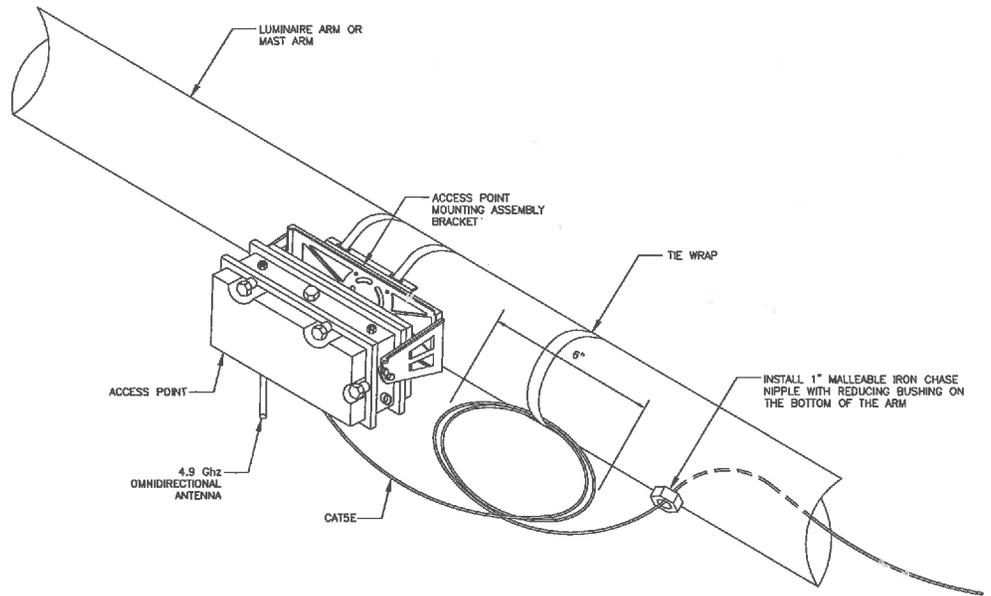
ANTENNA AND ACCESS POINT MOUNTING
